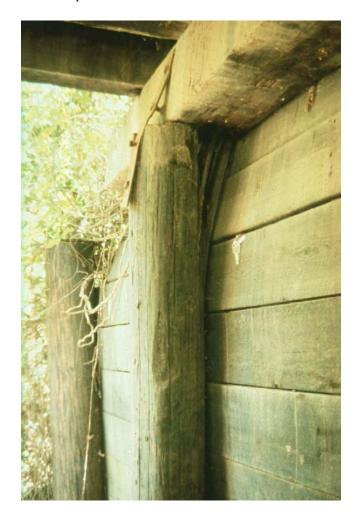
Local Failure in Timber Pile due to Lateral Movement of Abutment
